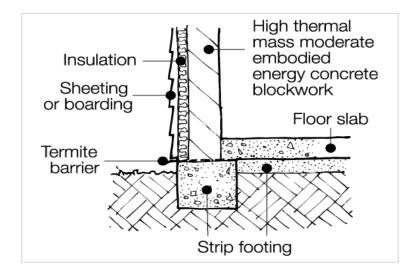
6: Joint of a thermal mass wall and floor slab (Reardon, McGee, Milne, 2013).
